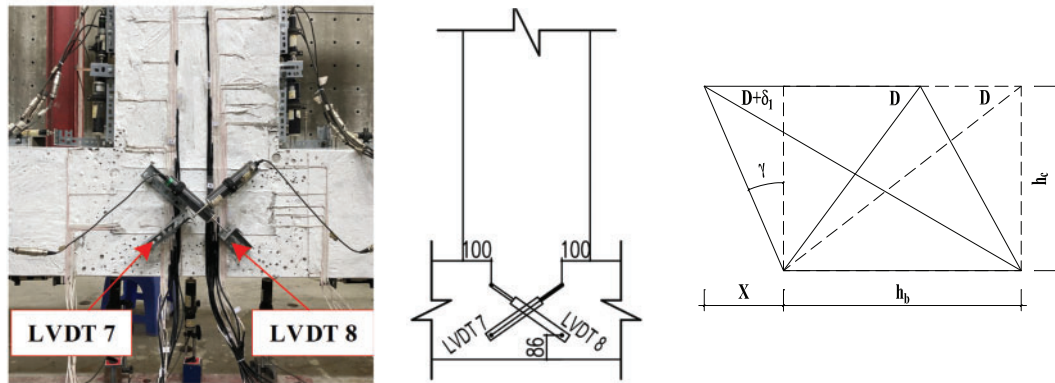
LVDT arrangement for measuring beam-column rotation (Unit: mm)
